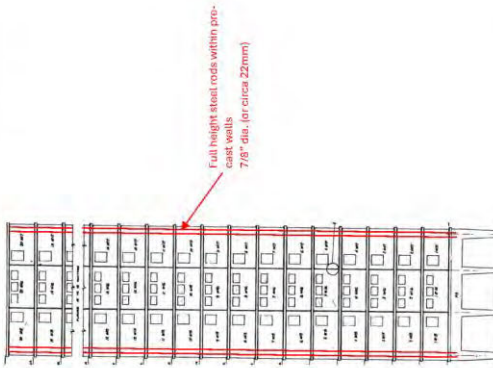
Elevation view of westernmost wall of west wing indicating full height tension rods within wall panels.
